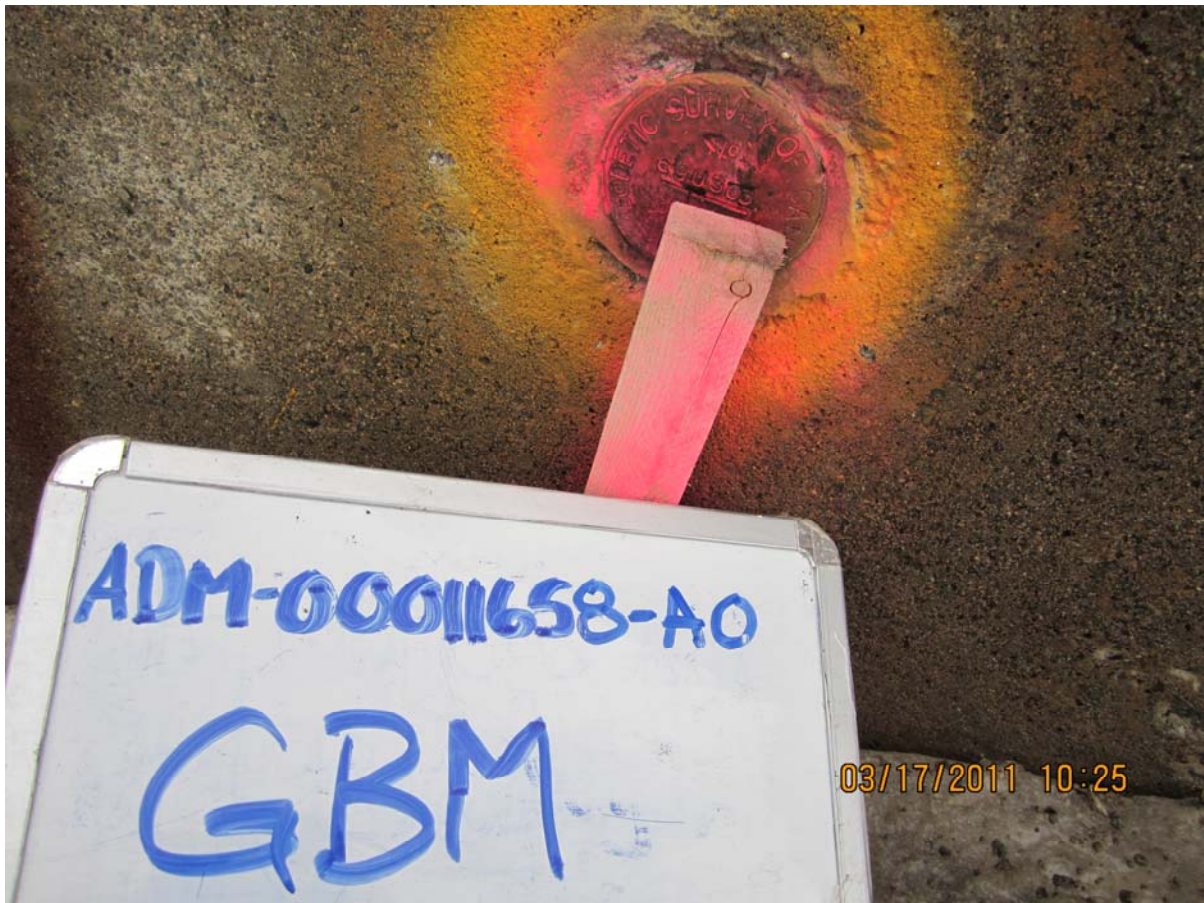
Local GBM at the site used for survey elevations of boreholes.
